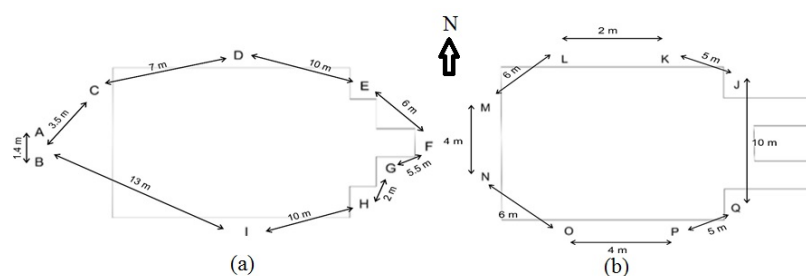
(a) markers placement on the ground floor of the building. (b) markers placement on the first floor of the building
